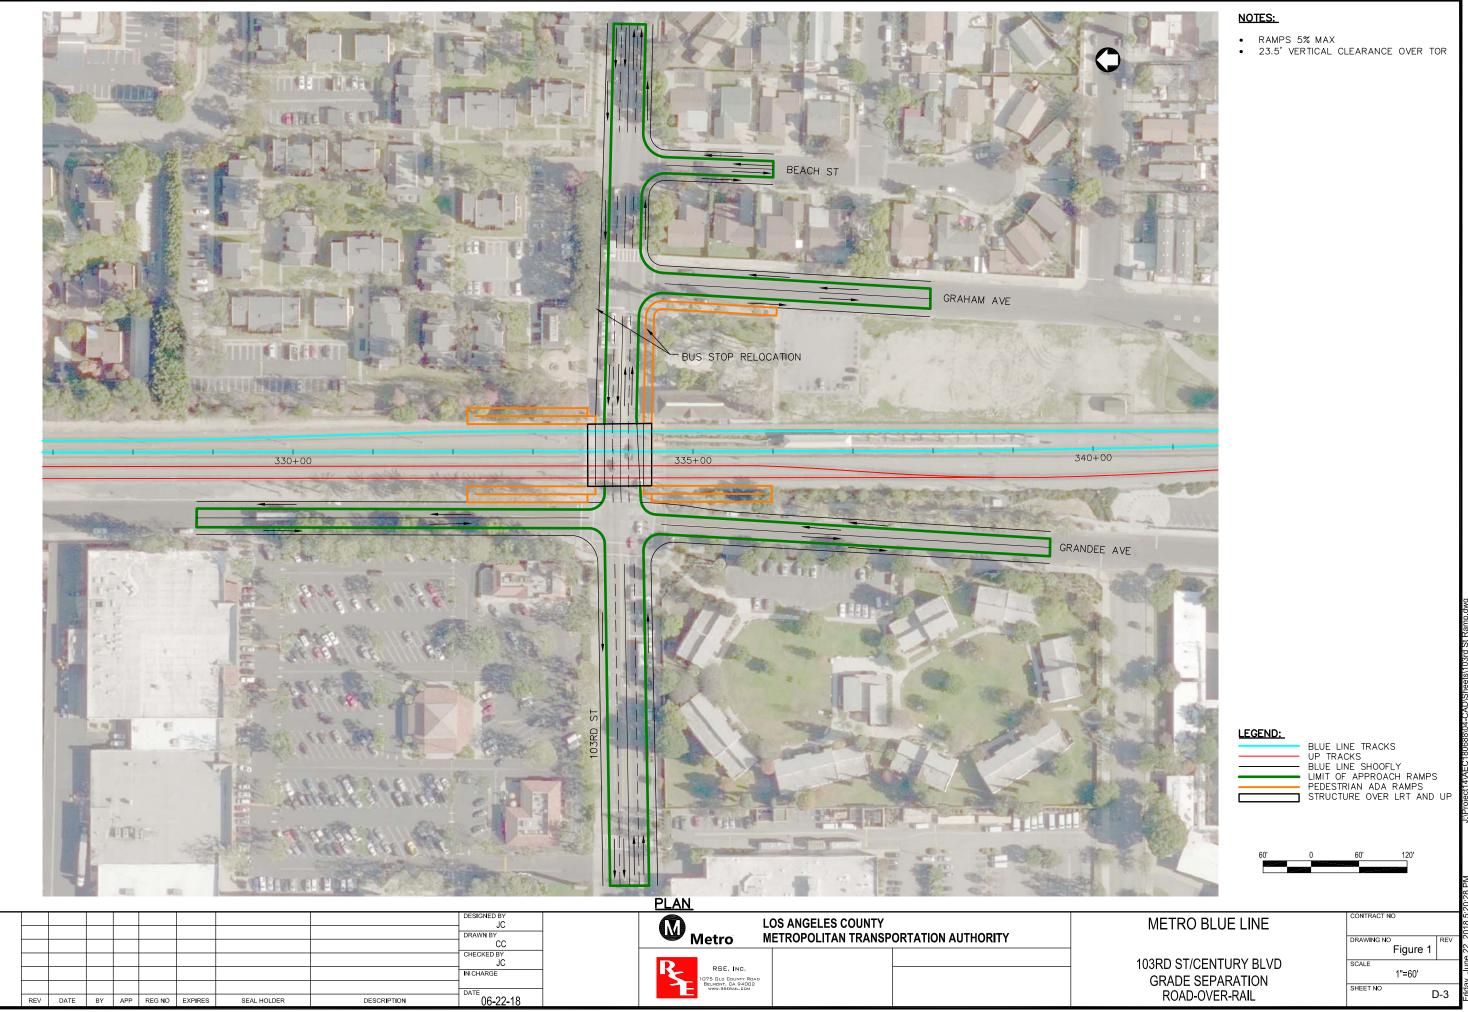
, a sketched footprint of 103rd Street road-over-rail grade separation, demonstrates the extent of elevated roadway structure's footprint and its potential impacts to the surrounding.
